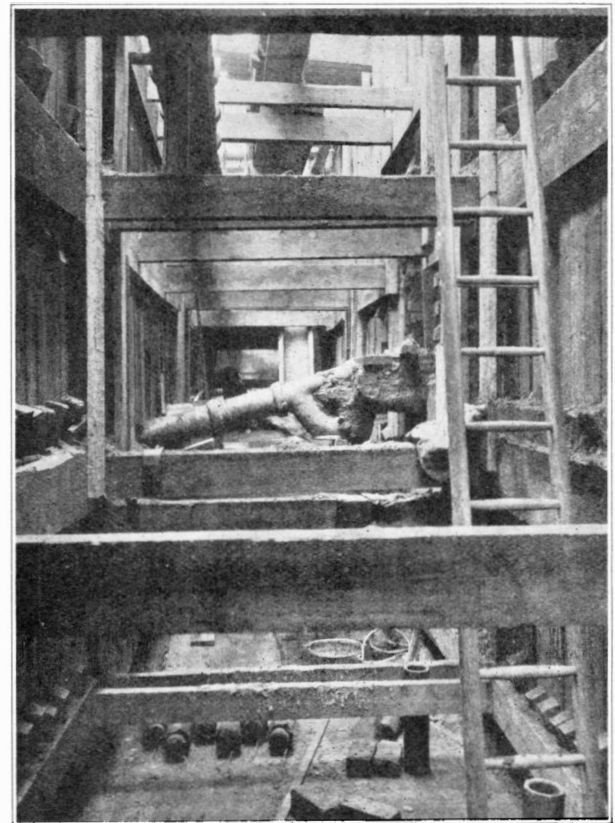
TRENCH FOR 126-WAY DUCT-LINE IN CHAPEL STREET, SALFORD.
